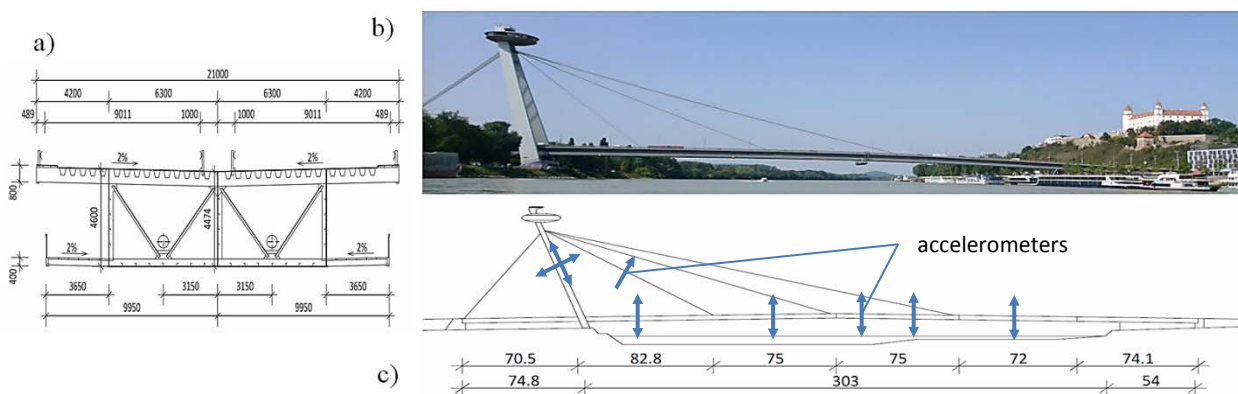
The SNP Bridge - a) cross-section, b) south view, c) side drawing (in m) with accelerometers.
